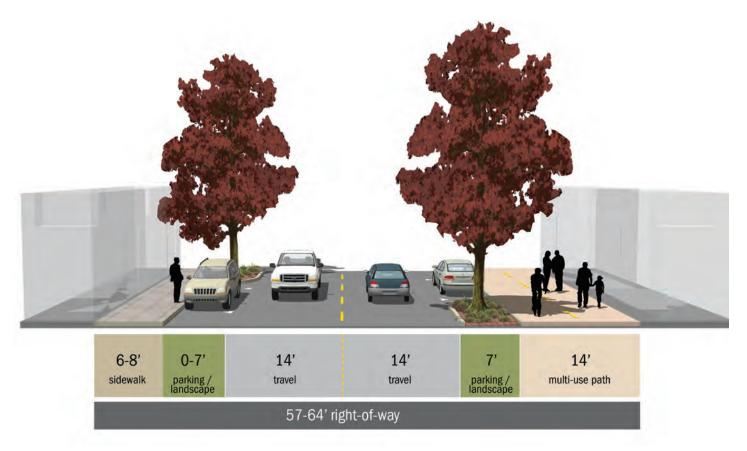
Conceptual Cross-Section for Main Street – North of Beta Street within existing right-of-way (looking north)
